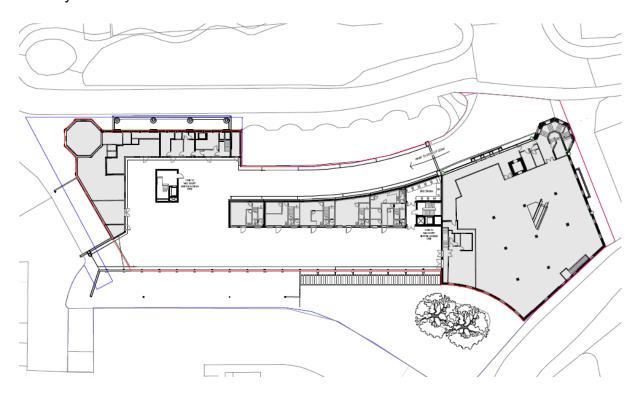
Existing First Floor - showing delivery ramp and roof deck. (Retail storage / spaces shown in grey)
